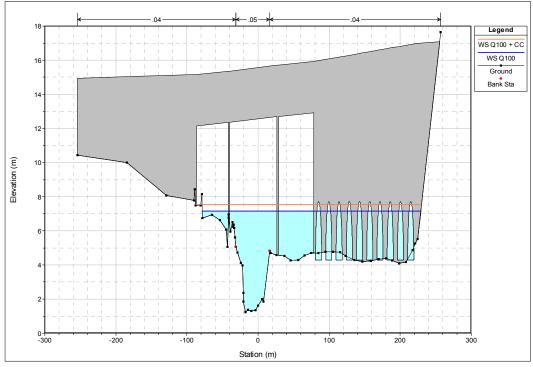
Proposed 3 Span Bridge Structure with embankment culverts (10 No. 8.5m wide by 3.4m high concrete arch culverts)
